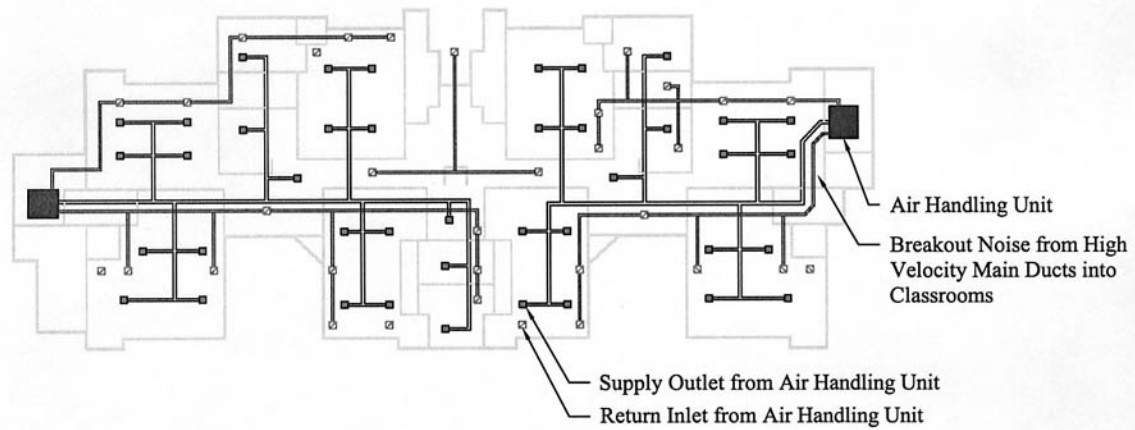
Conceptual floor plan of Case Study 5: Central AHU Systems with Clustered Plan
